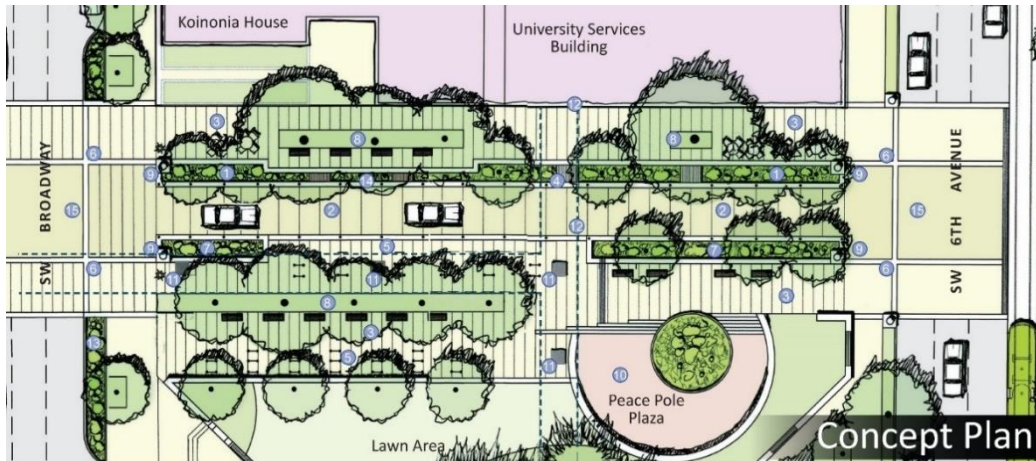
SW Montgomery Green Street concept plan. Source: ASLA.com
